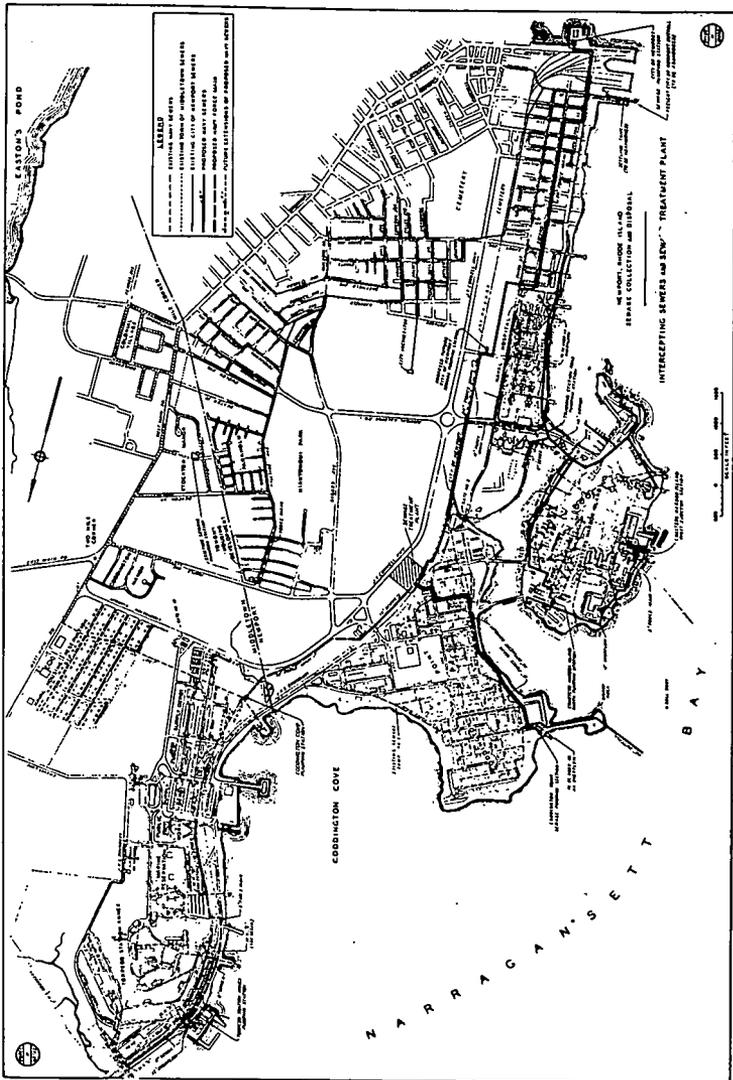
INTERCEPTING SEWERS AND SEWAGE TREATMENT PLANT.
